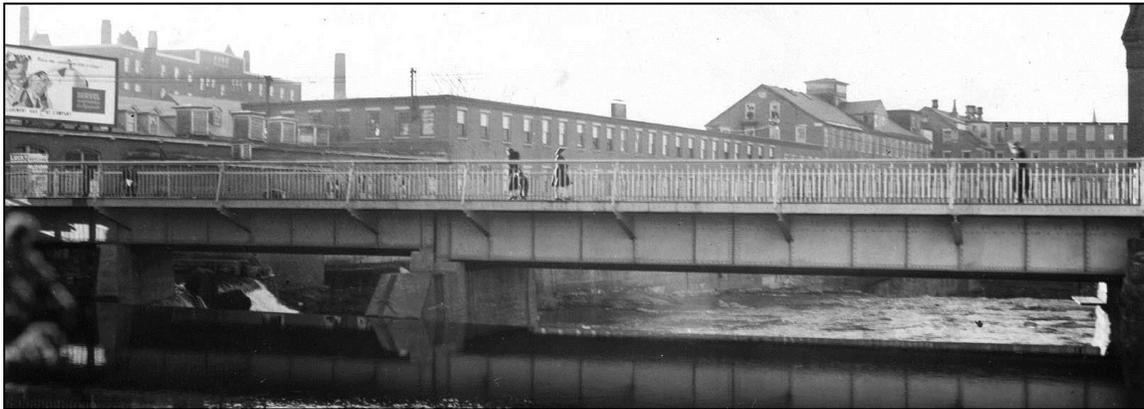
Claremont 132-097, Broad St. Bridge over Sugar River. This 2 span deck plate girder bridge was designed by Storrs and built by United Construction Co. in 1915. It had an overall length of 138 feet. Replaced in 1981 with a single-span I-beam bridge. Photos taken during inspection of the bridge by NHHD engineers on November 19, 1940 (NHHD Bridge Inventory Card).
